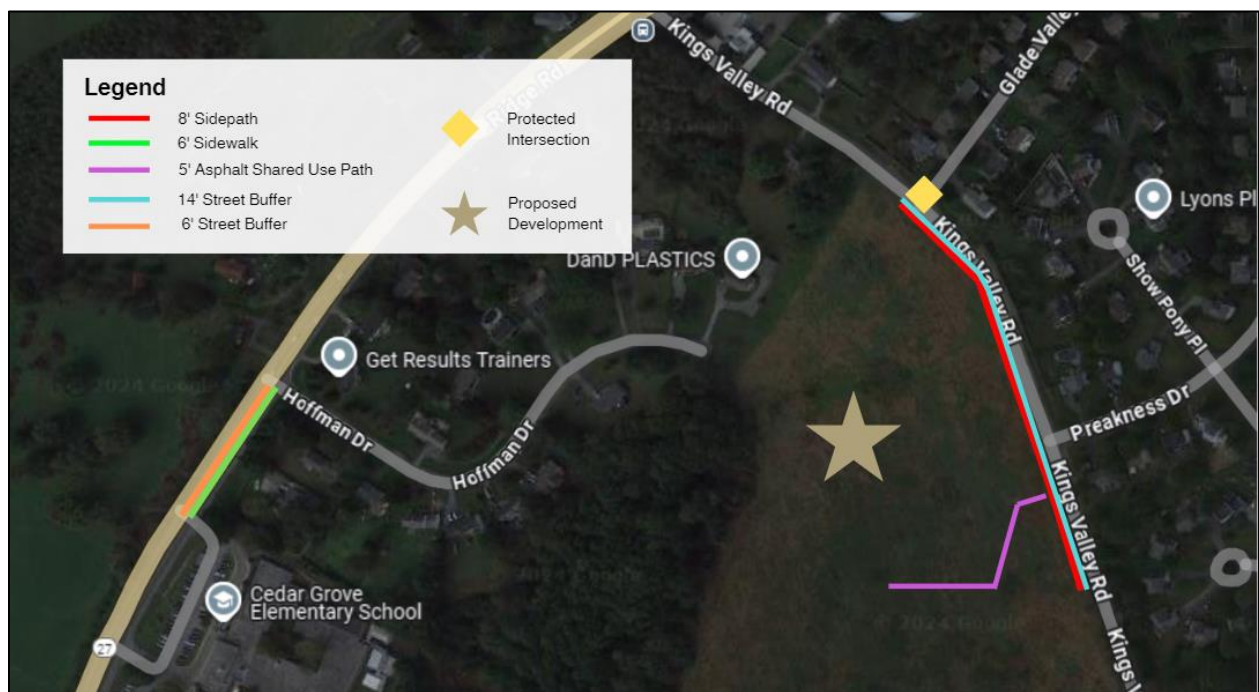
Proposed Pedestrian and Bicycle On-Site and Off-Site Improvements
